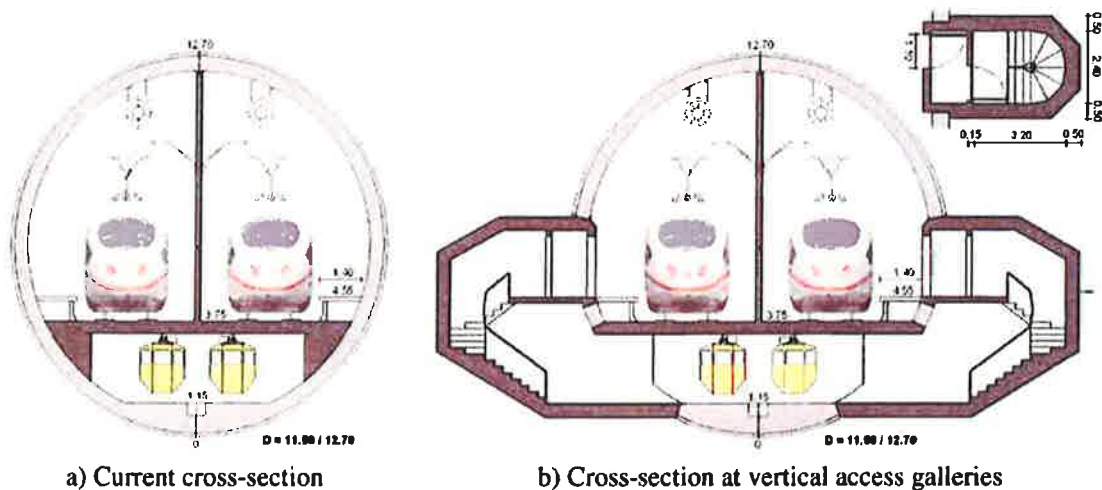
Alternative TBM tunnel solution - Current cross-section
